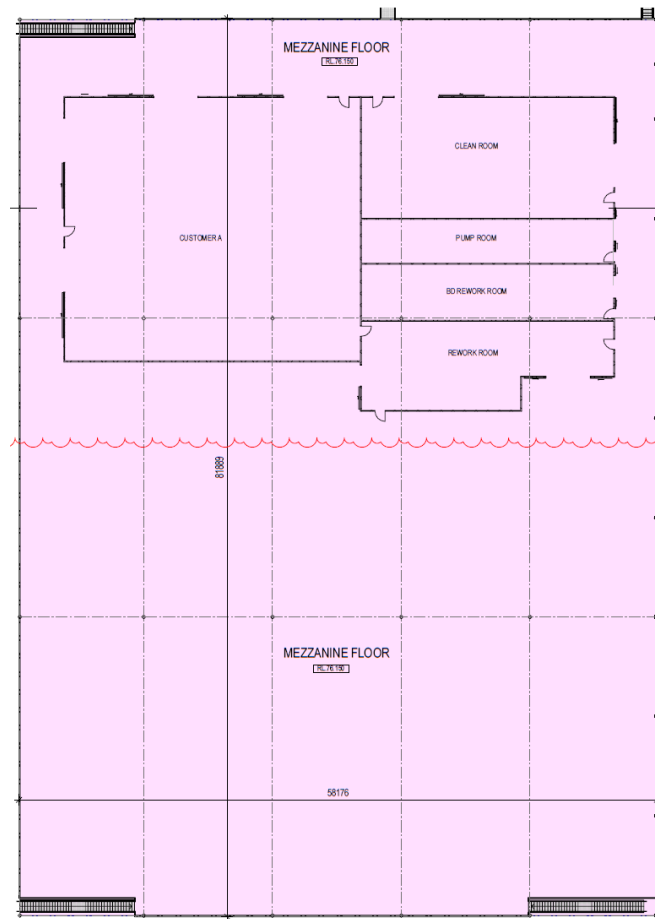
| Detailed floor plan of mezzanine, including ‘technical rooms’
